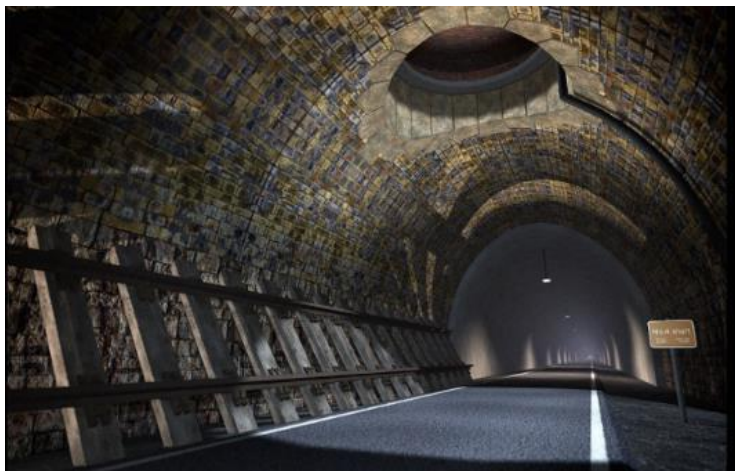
Active travel route on former Shanklin to Ventnor railway line
